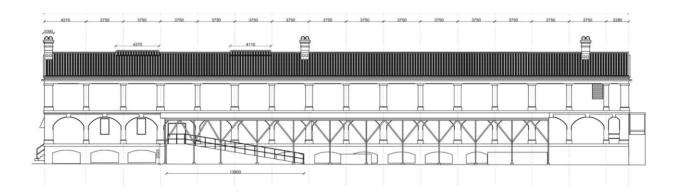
South faç ade, nowadays. (Source: Architectural Services Department)
